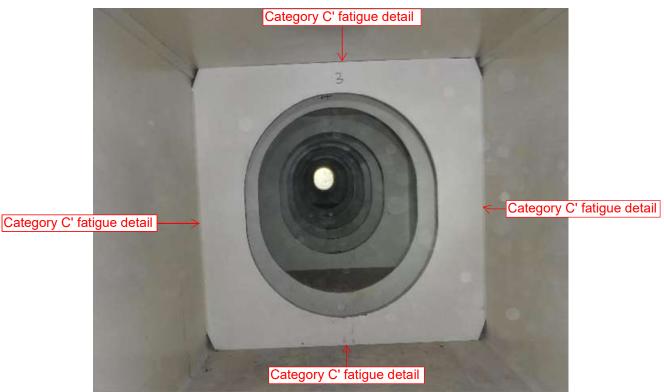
Category C' fatigue detail- Diaphragm fillet welds to webs and flanges
